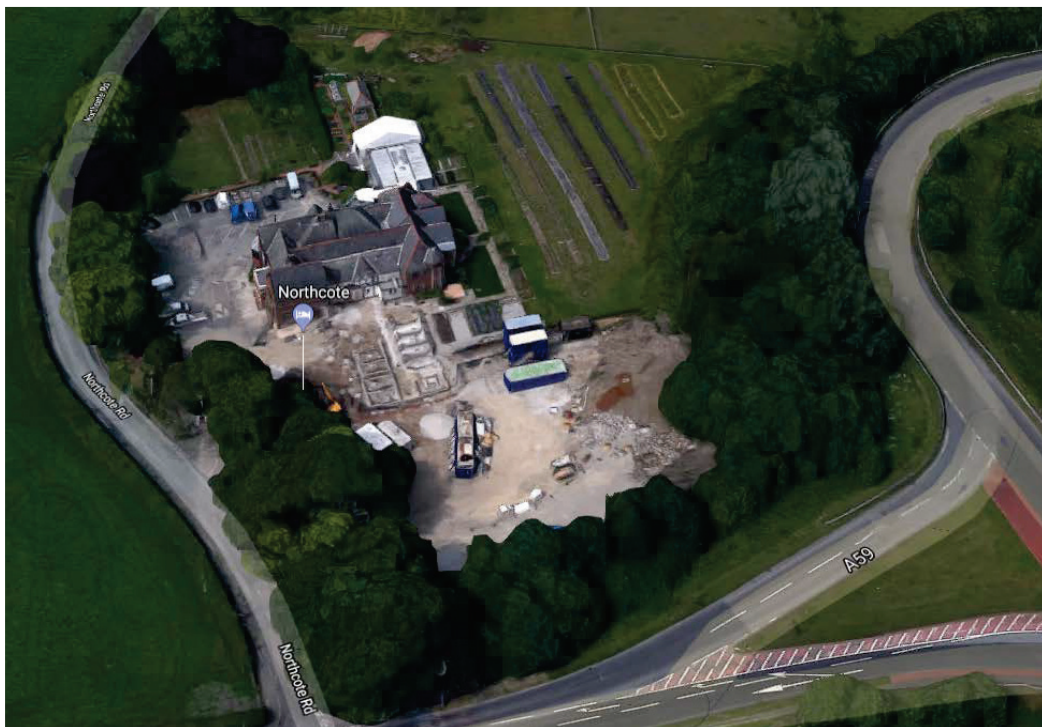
Archive photo from Google earth shows the current trees around the site to be retained.
